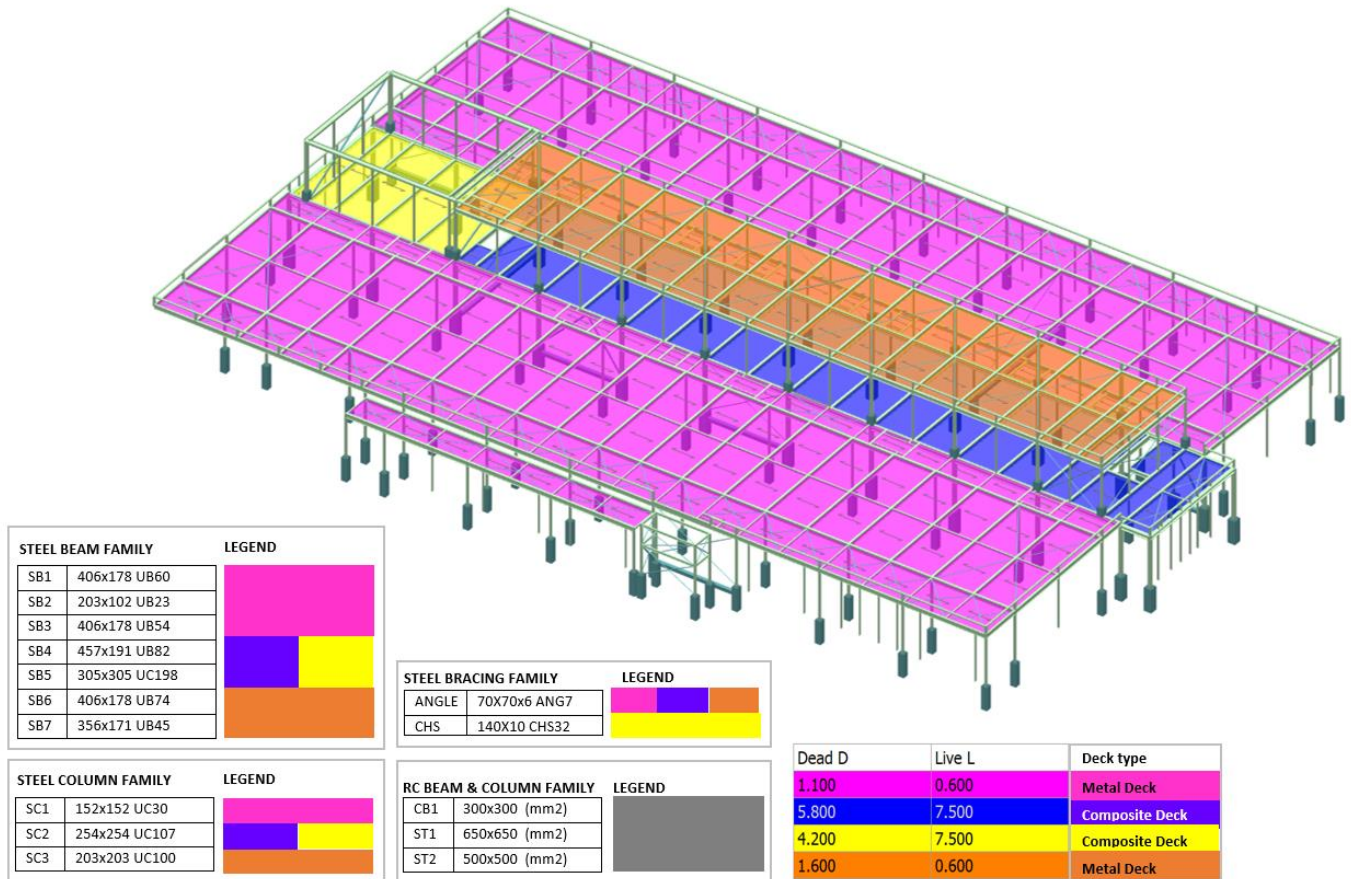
Building layout showing structural framing system – steel beam family, steel column family, steel bracing family, RC beam and column family used in this project. Type of decking systems and the loads (dead + imposed) correspondence to them are also illustrated.
